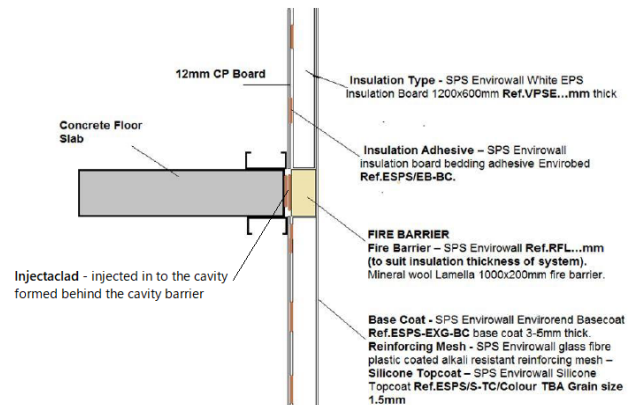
Cross-section of the cladding system detailing render system (supplied by Test Sponsor).
